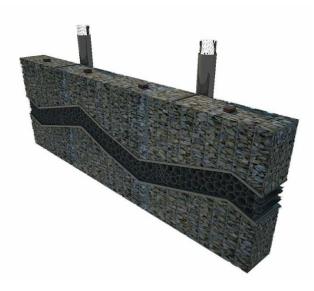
Perspective shot of the second proposal. Drainage pipes were used as columns and the gabion baskets were installed through angles and panels with the columns Source: Designed and drawn by the author
